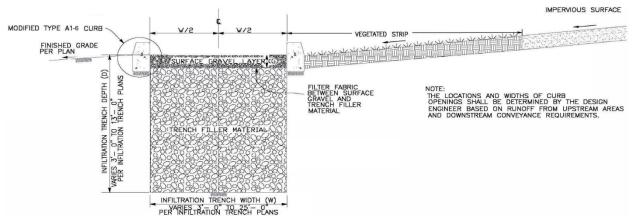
Vegetated Strip as a Pretreatment BMP for Infiltration Trench
